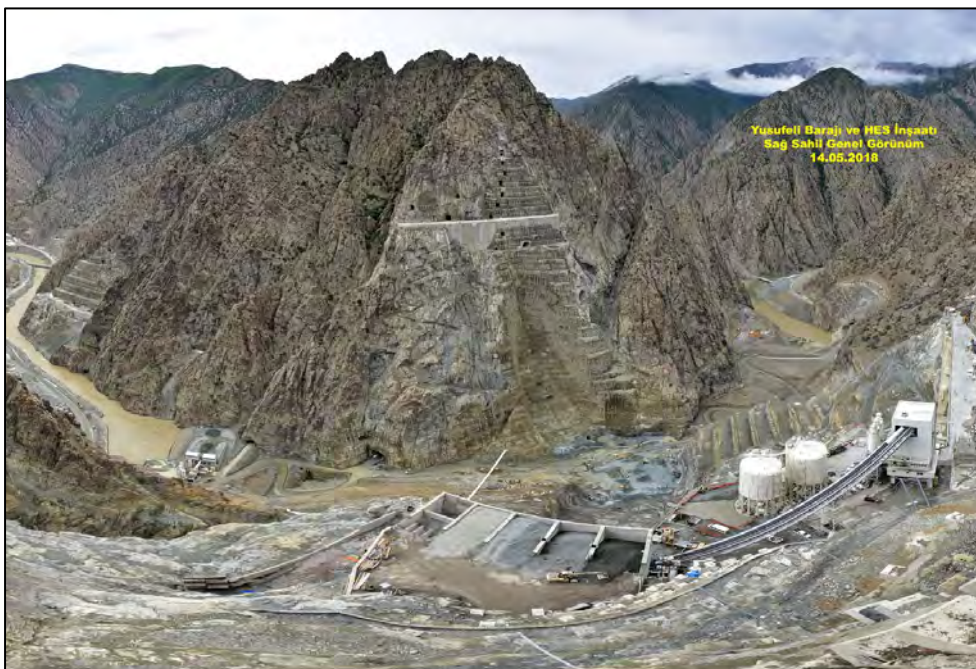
Wide angle view of dam excavation looking onto the right abutment of the dam site
